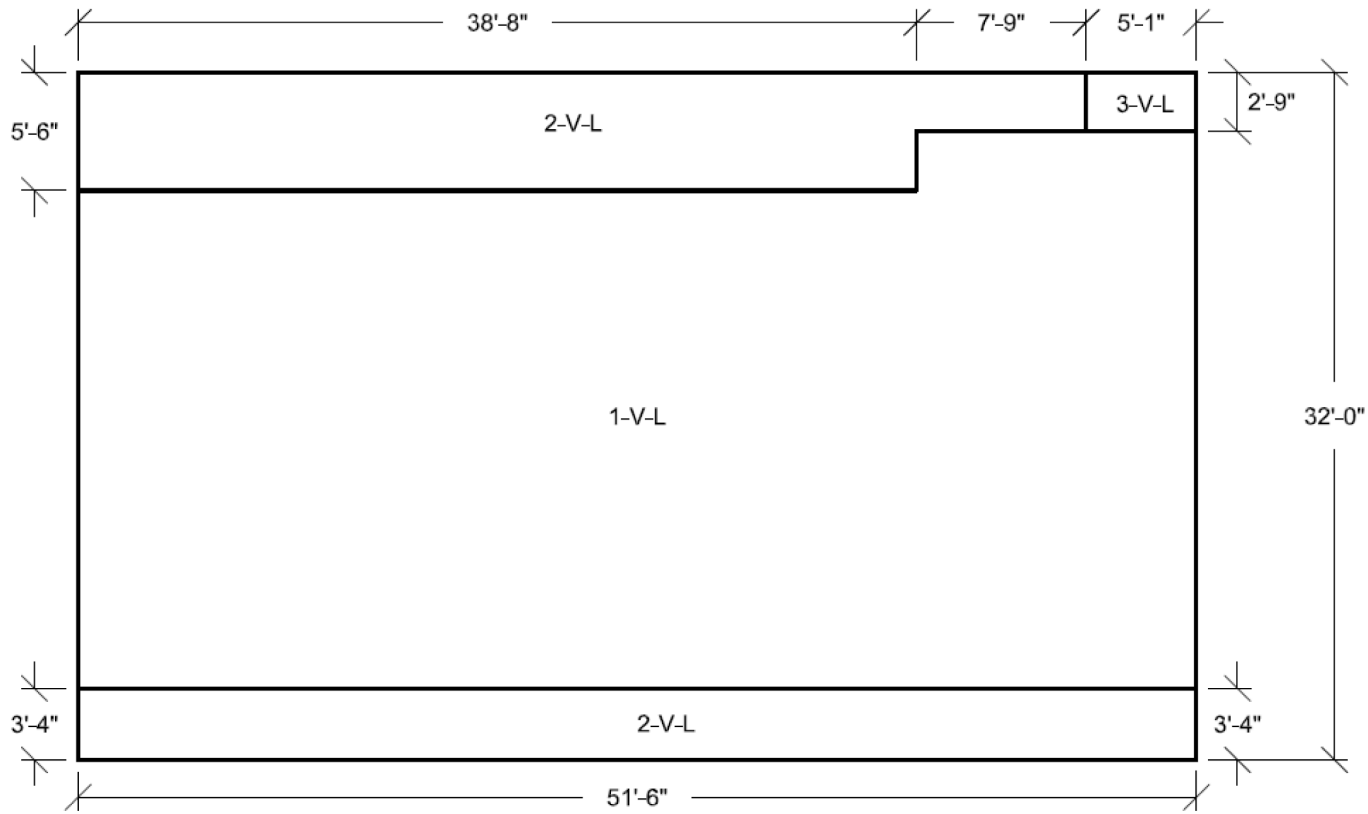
H.6-148 DGFOV Roof 2 Looking Down Vertical Reinforcement Zones Near Side Face
